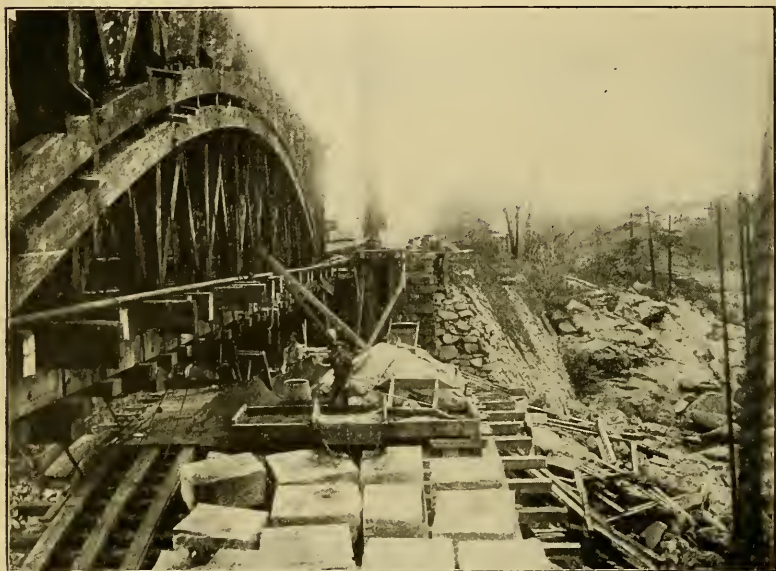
LAYING ARCH STONES AT BELLOWS FALLS.
